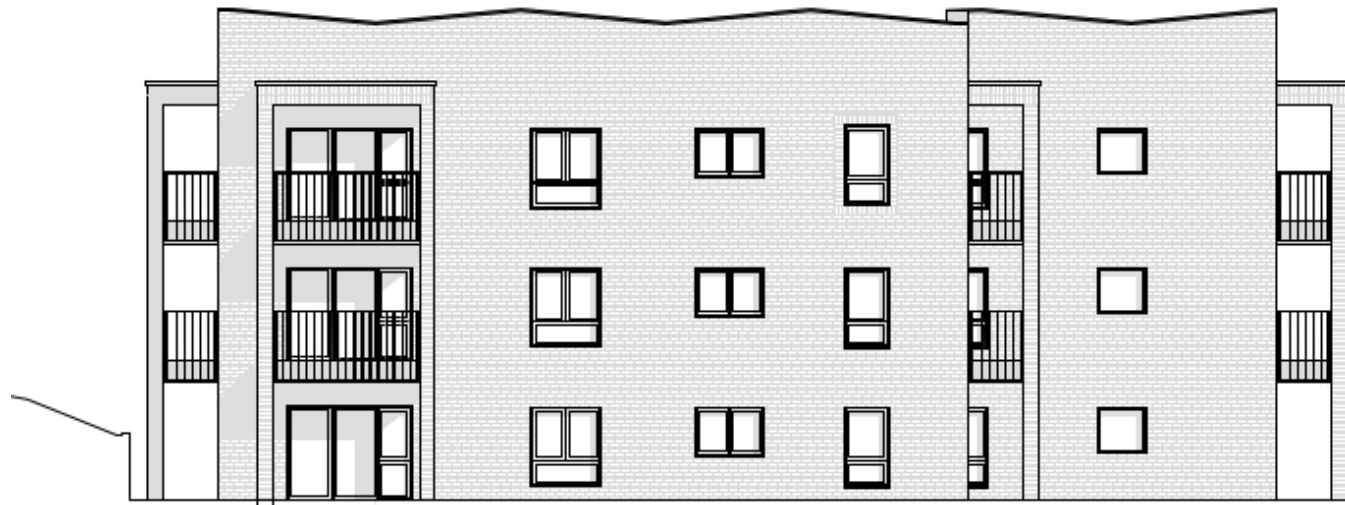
North Elevation of the proposed East Pavilion Portslade Village Centre Development
